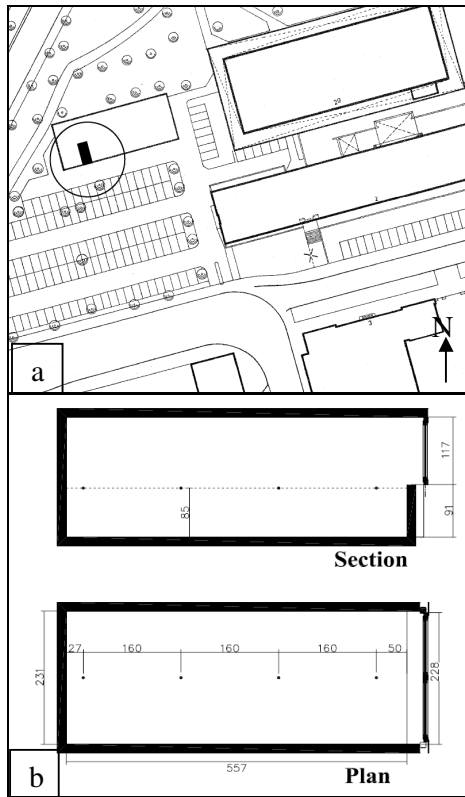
1a. Site plan (test room in circle) 1b. Floor plan and section of the test room
